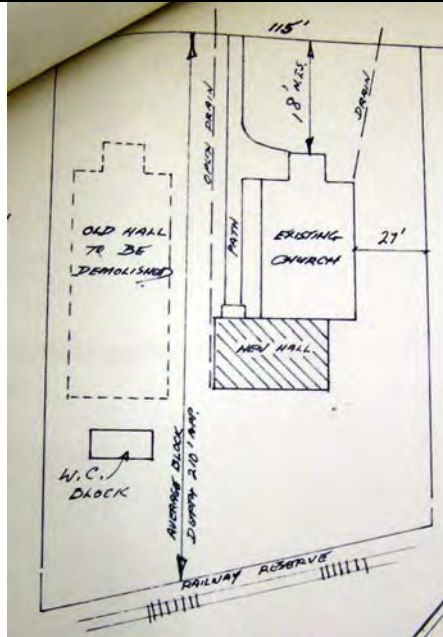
M.F. Murray, Site Plan of the Wallace Methodist Church showing 'old hall' (former Millbrook Methodist Church) proposed for demolition (right) and the rear addition to the Church building (former Bolwarrah Methodist Church), 1965.
